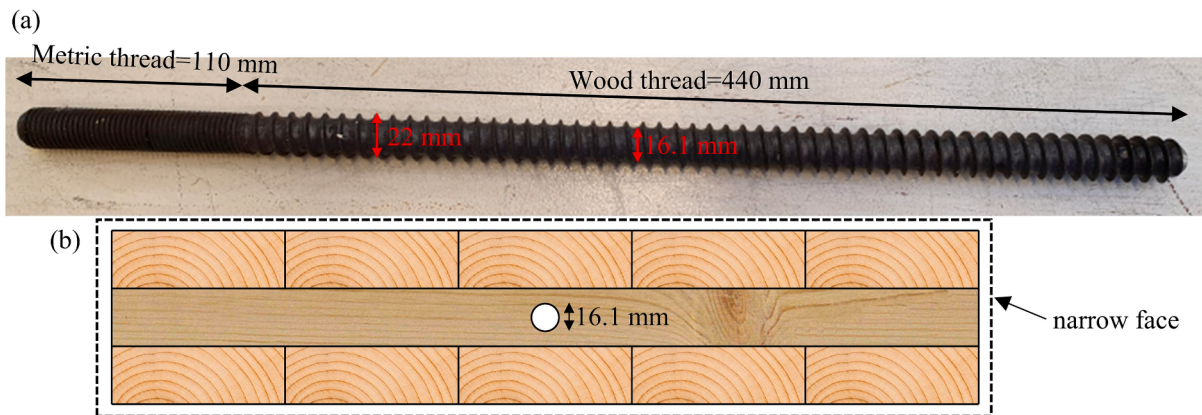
(a) threaded rod, (b) predrilled hole at the narrow face of the CLT panel.
